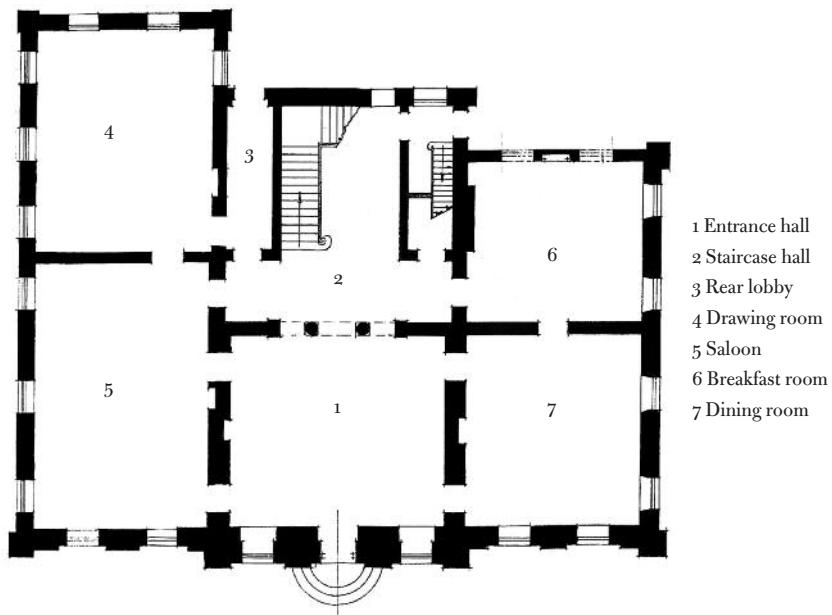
St Helen's House, reconstructed plans of the ground floor as in 1767. *Maxwell Craven.
